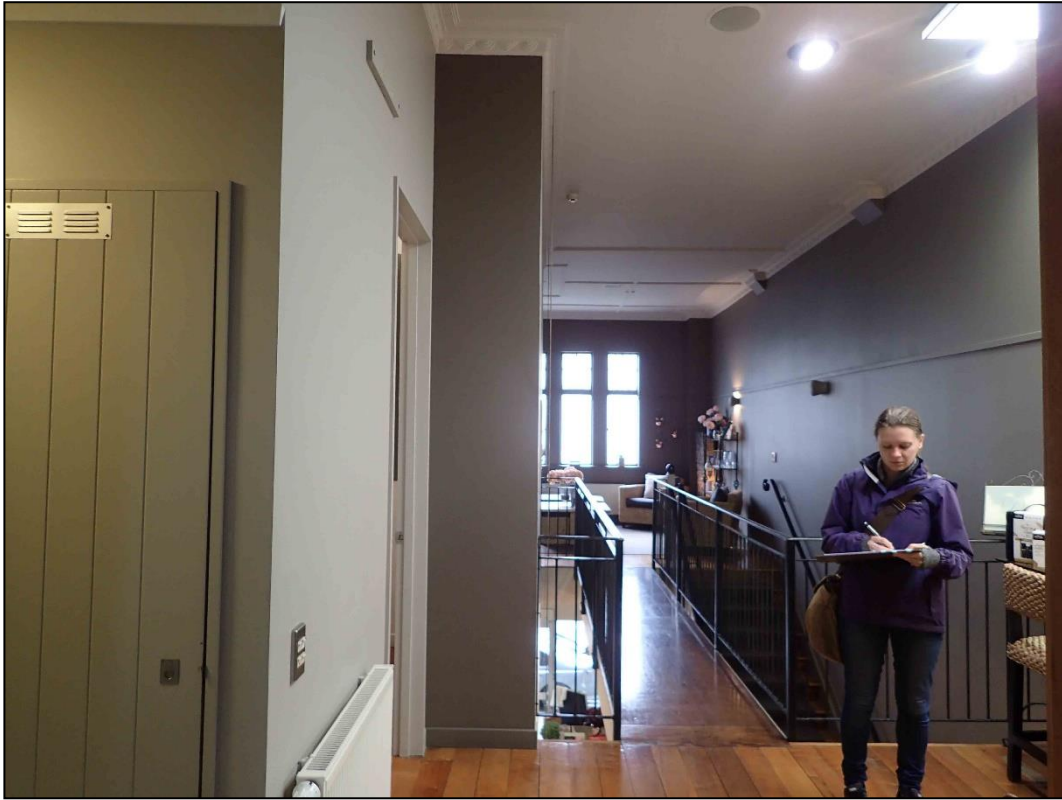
First floor of 18 Kelvin Street, looking east, showing gangway.
